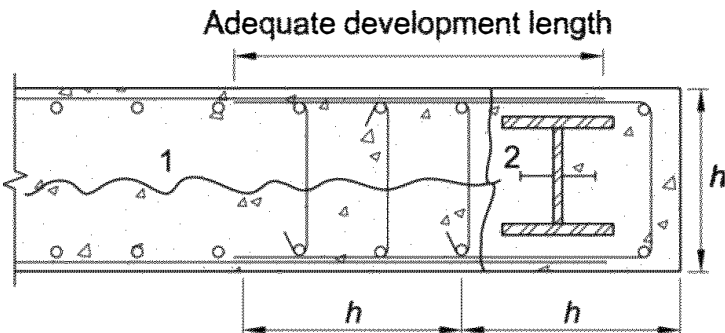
Reinforcement to prevent splitting failures.
